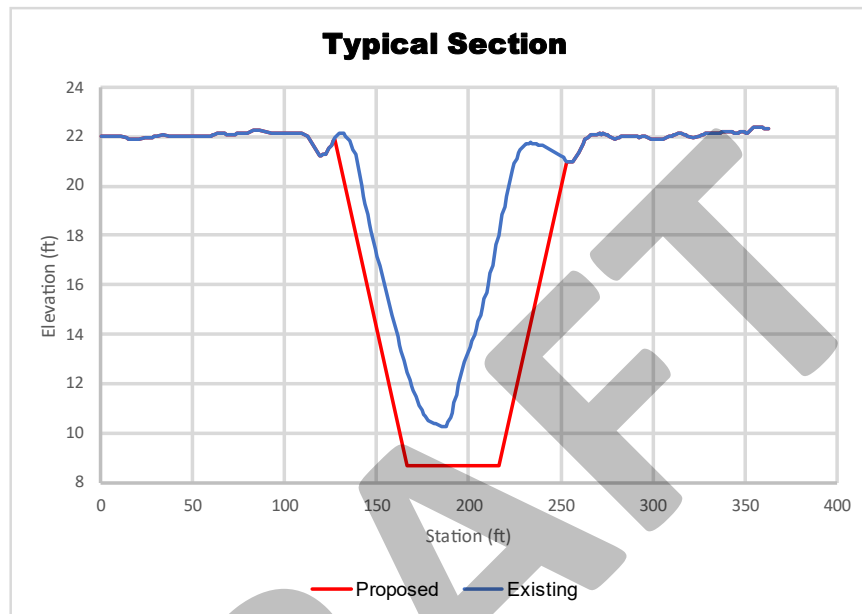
ROSEDALE IMPROVEMENT SYSTEM TYPICAL SECTION
